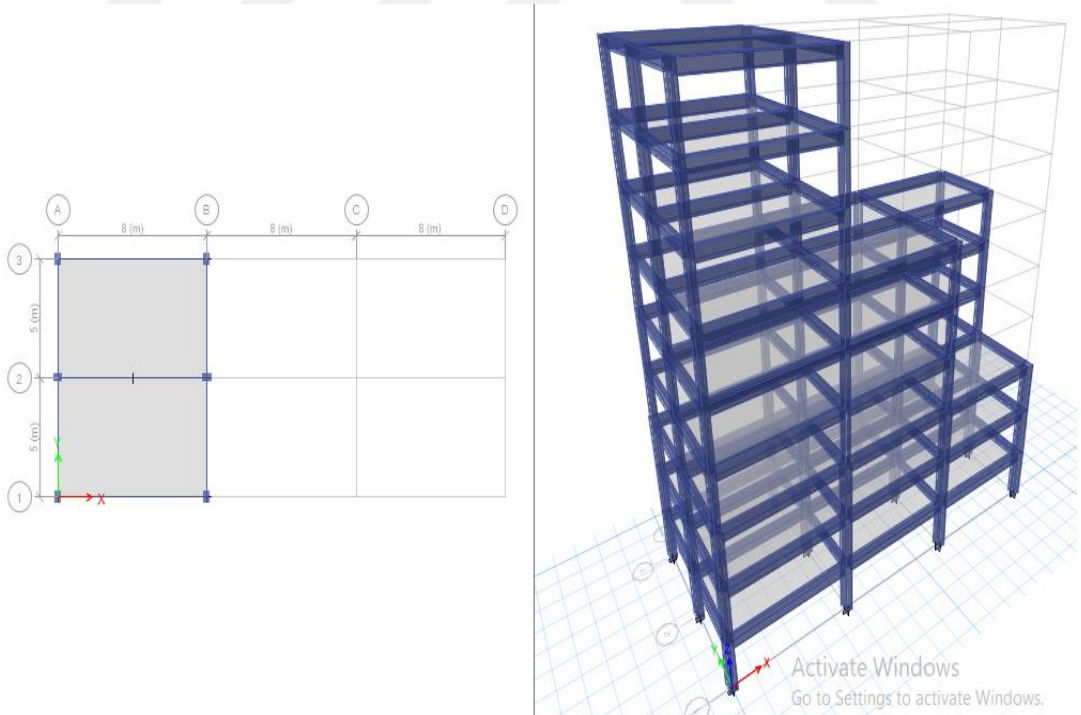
Seventh to ninth story plan and 3D of 9 story irregular rcc building
